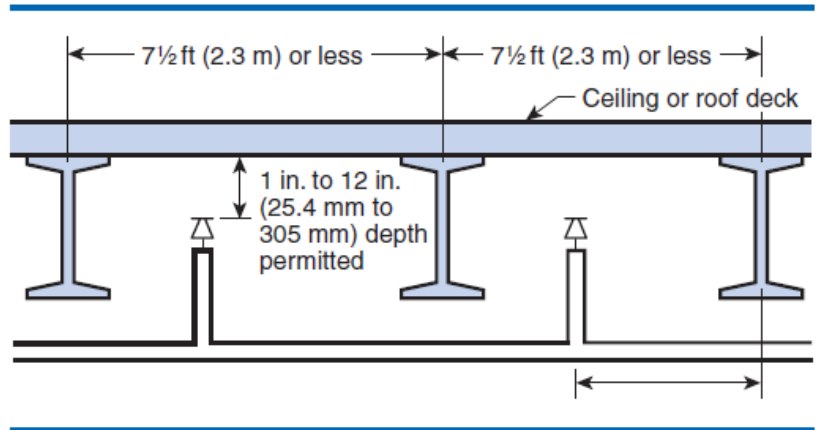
Placement of Standard Spray Upright Sprinklers Underneath Obstructed Construction with Sprinkler Deflector Positioned Above Bottom of Structural Member.
